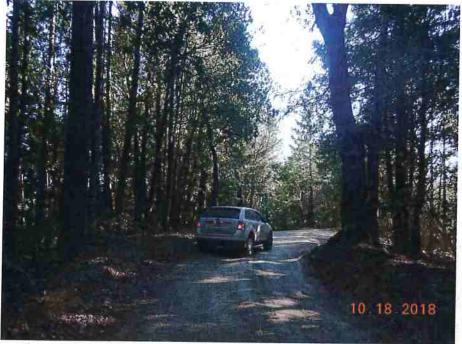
RP4. Pinch Point. No sight distance restriction. Turnout provided. Facing south.
